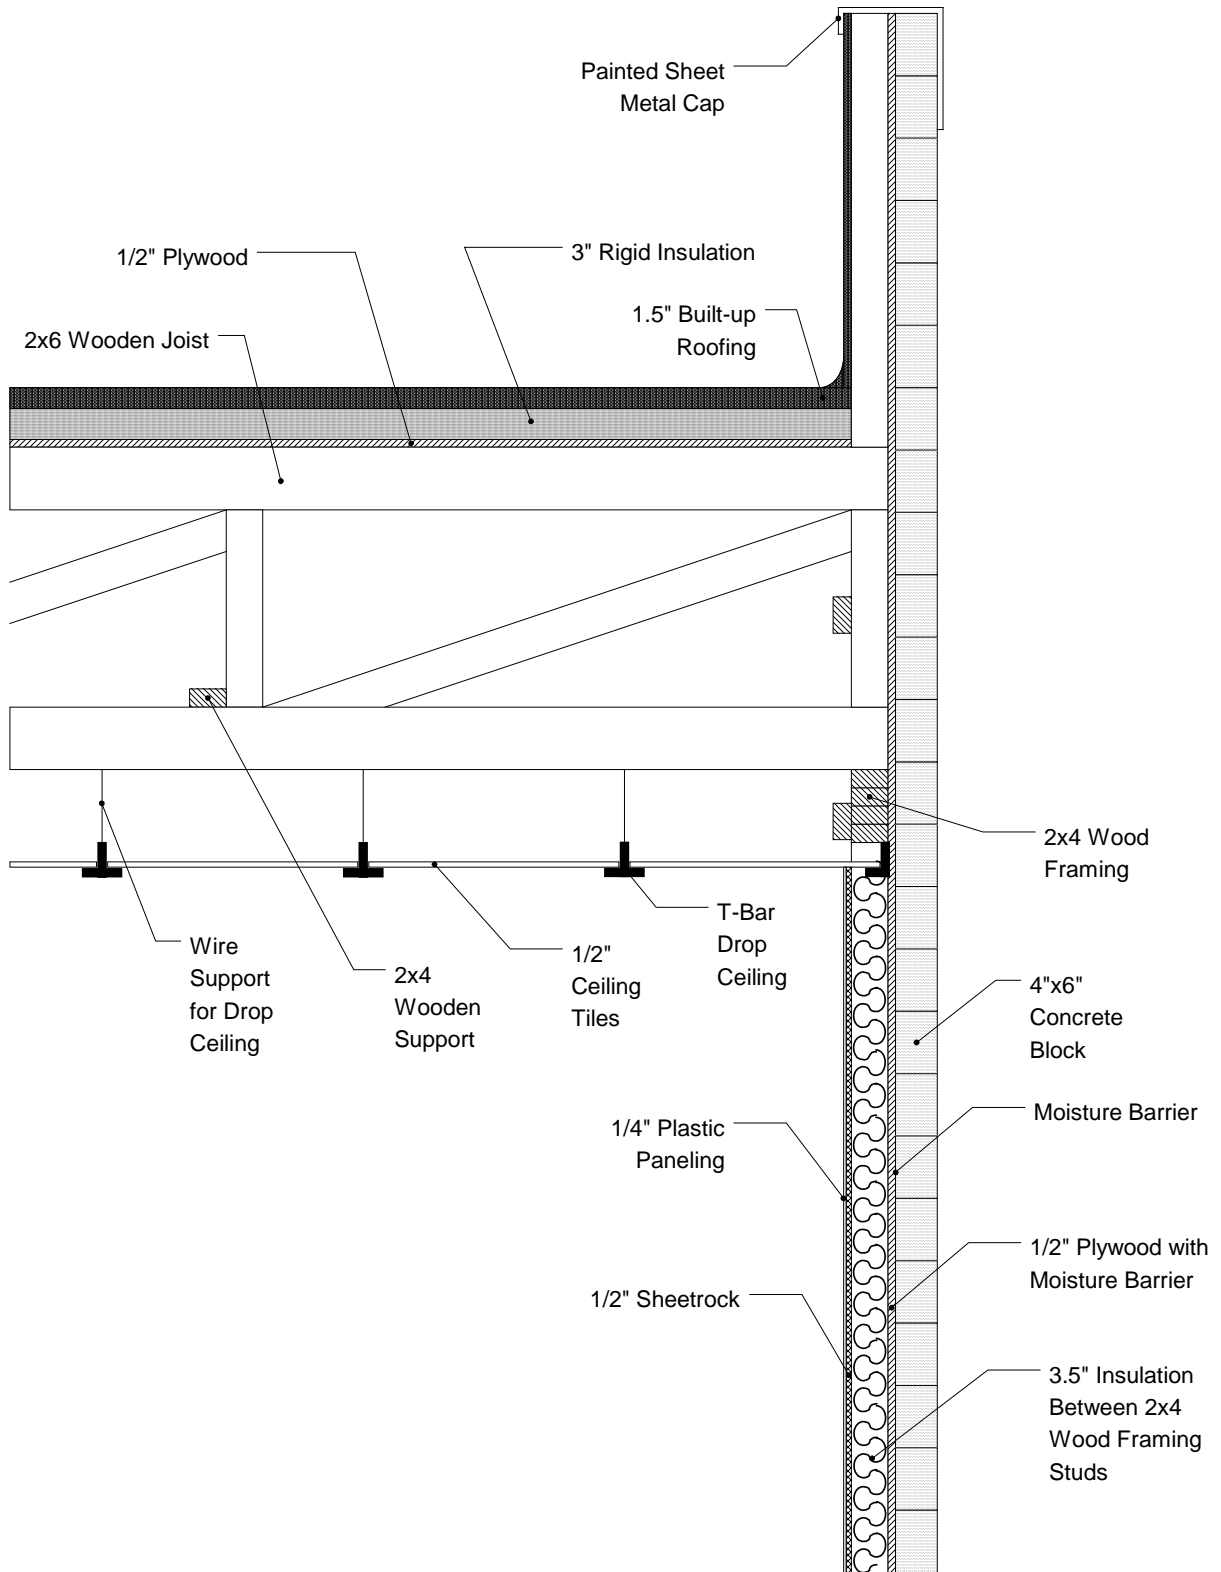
Roof, Ceiling and Wall Construction without Awning
